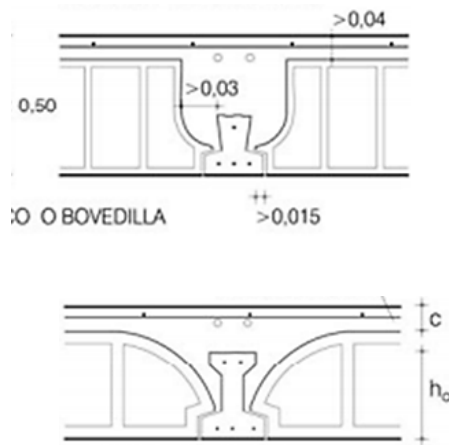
Filler block cross sections and rib dispositions (FECEA)
